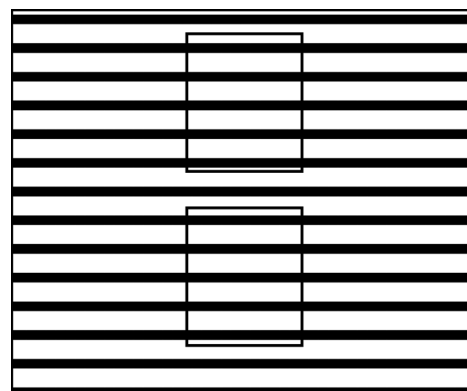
Glulam beam showing locations where specimens were cut for delamination testing.
